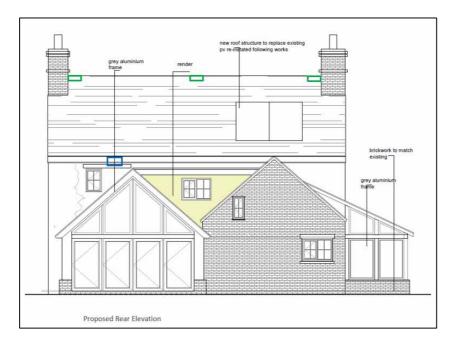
Creation of access and roosting opportunities under lifted ridge tiles in new roof
